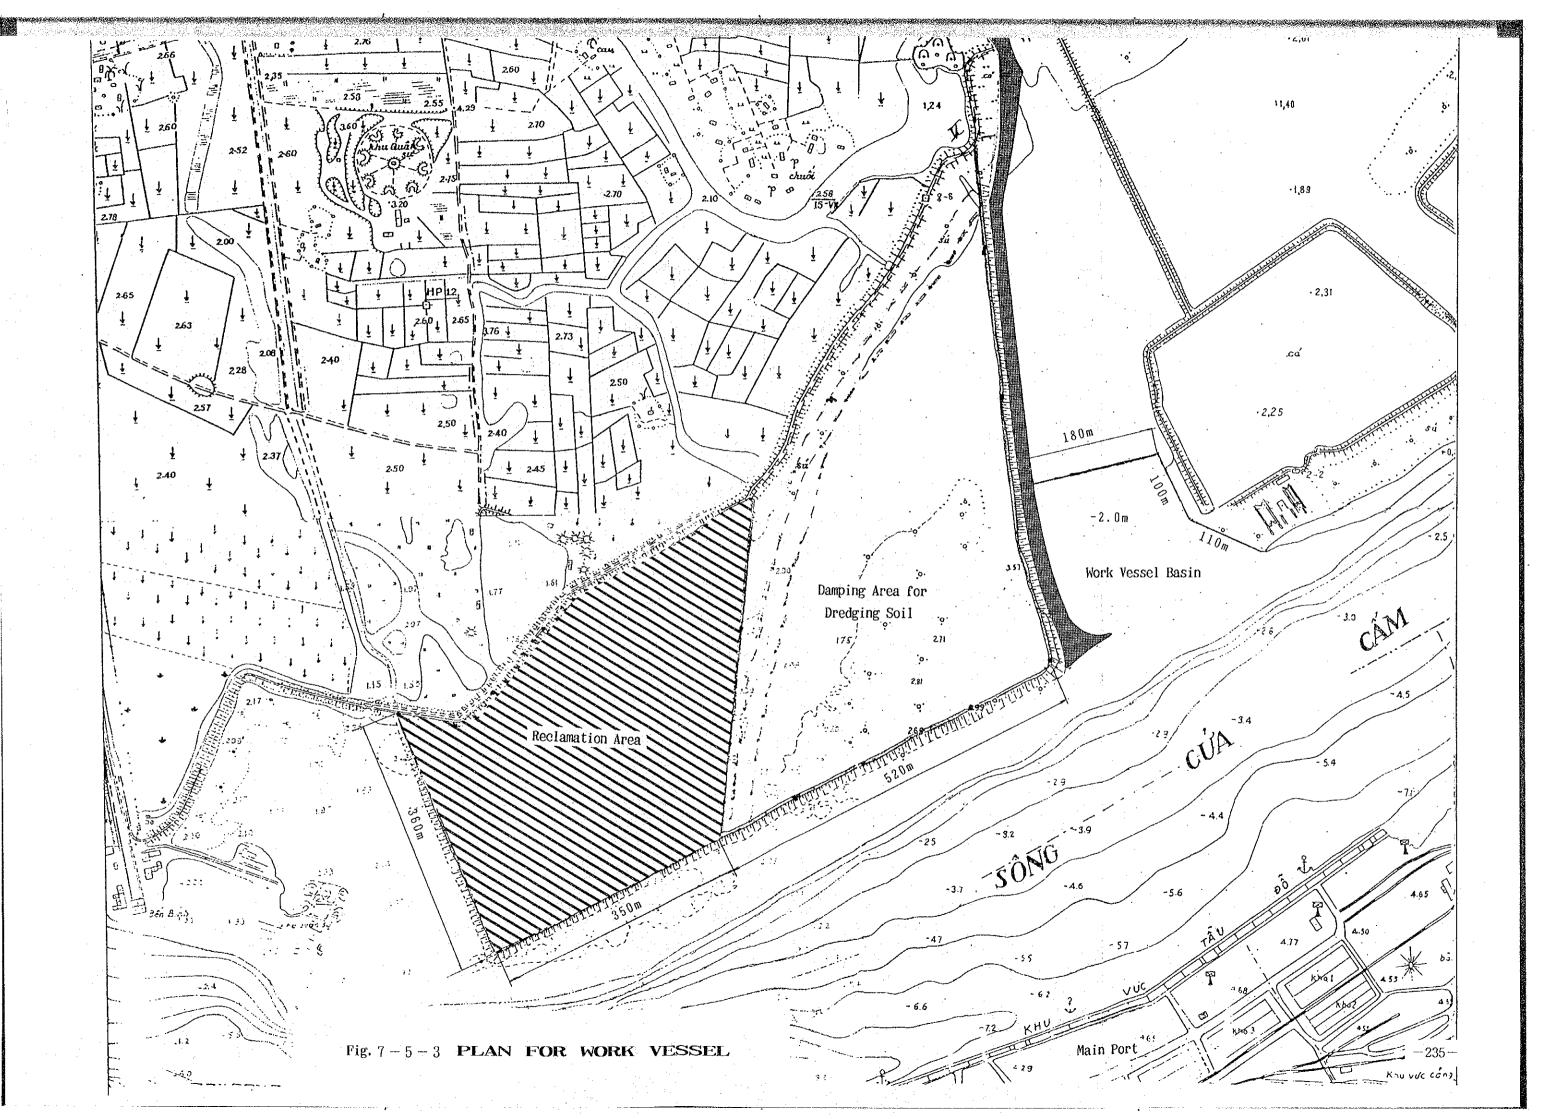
shows berth use plan. Figure 7-5-2 shows bonded transit warehouse layout plan. The plan consists of converting No.13 warehouse to a bonded transit warehouse, constructing a new gte and road and reducing the existing motor pool area. Figure 7-5-3 shows work vessel basin and damping place for dredging soil on the opposite side of Cam river in case of lengthening berth No.1.
